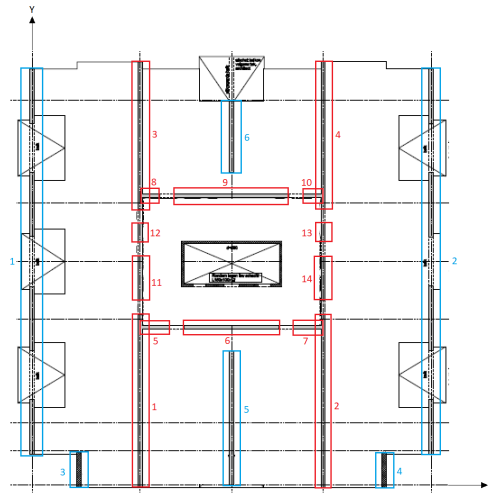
New Orleans tower stability system and element numbering level 3-10
